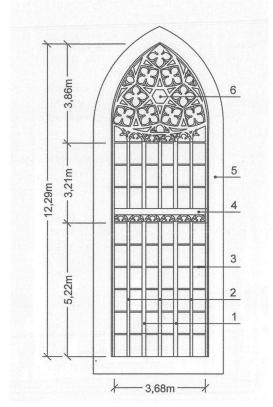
Choir window: 1 main bars 2 minor bars 3 saddle bars 4 central beam 5 reveal 6 tracery
